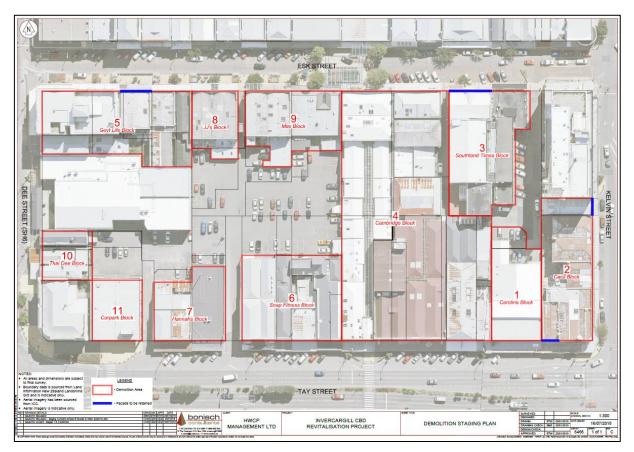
Demolition staging plan (Bonisch Consultants, 2018).
